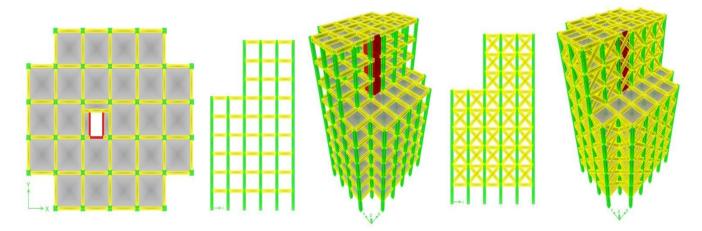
Plan, Elevation and 3D view of bare and infill frame for model-7 and model-8 respectively.
